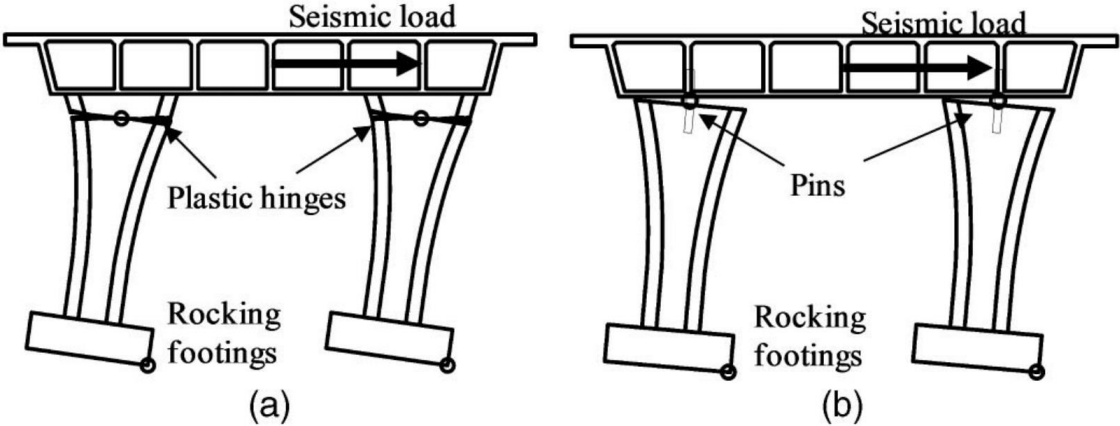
Idealized failure mechanisms of a bridge with (a) rocking foundation and column yielding at the top; and (b) rocking foundation and nonyielding column (Deng et al., 2012).
